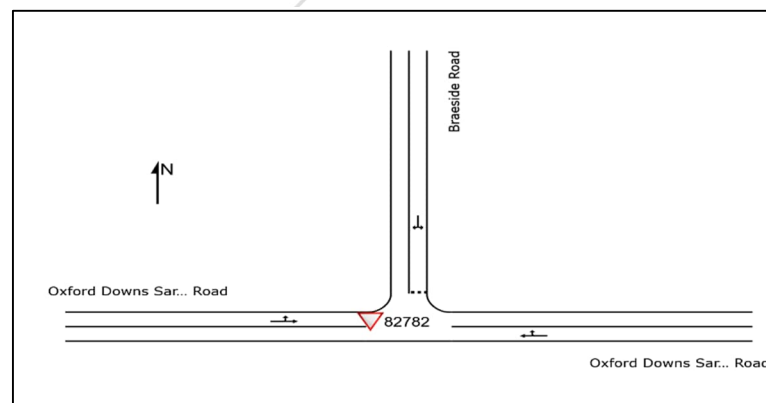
Oxford Downs Sarina Road / Braeside Road Intersection Layout
